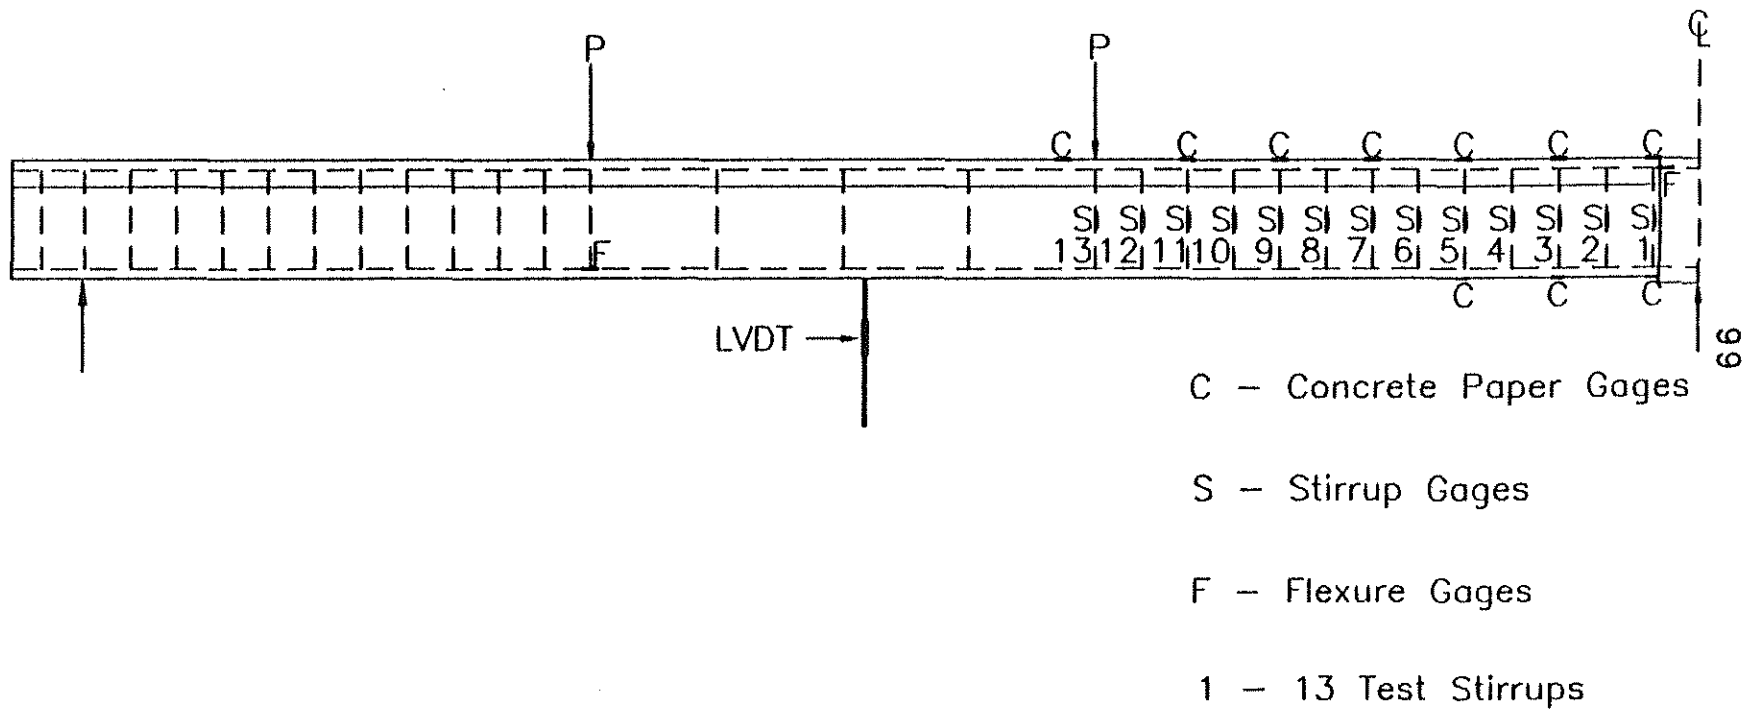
b Strain gage locations I-3, J-2, J-3
